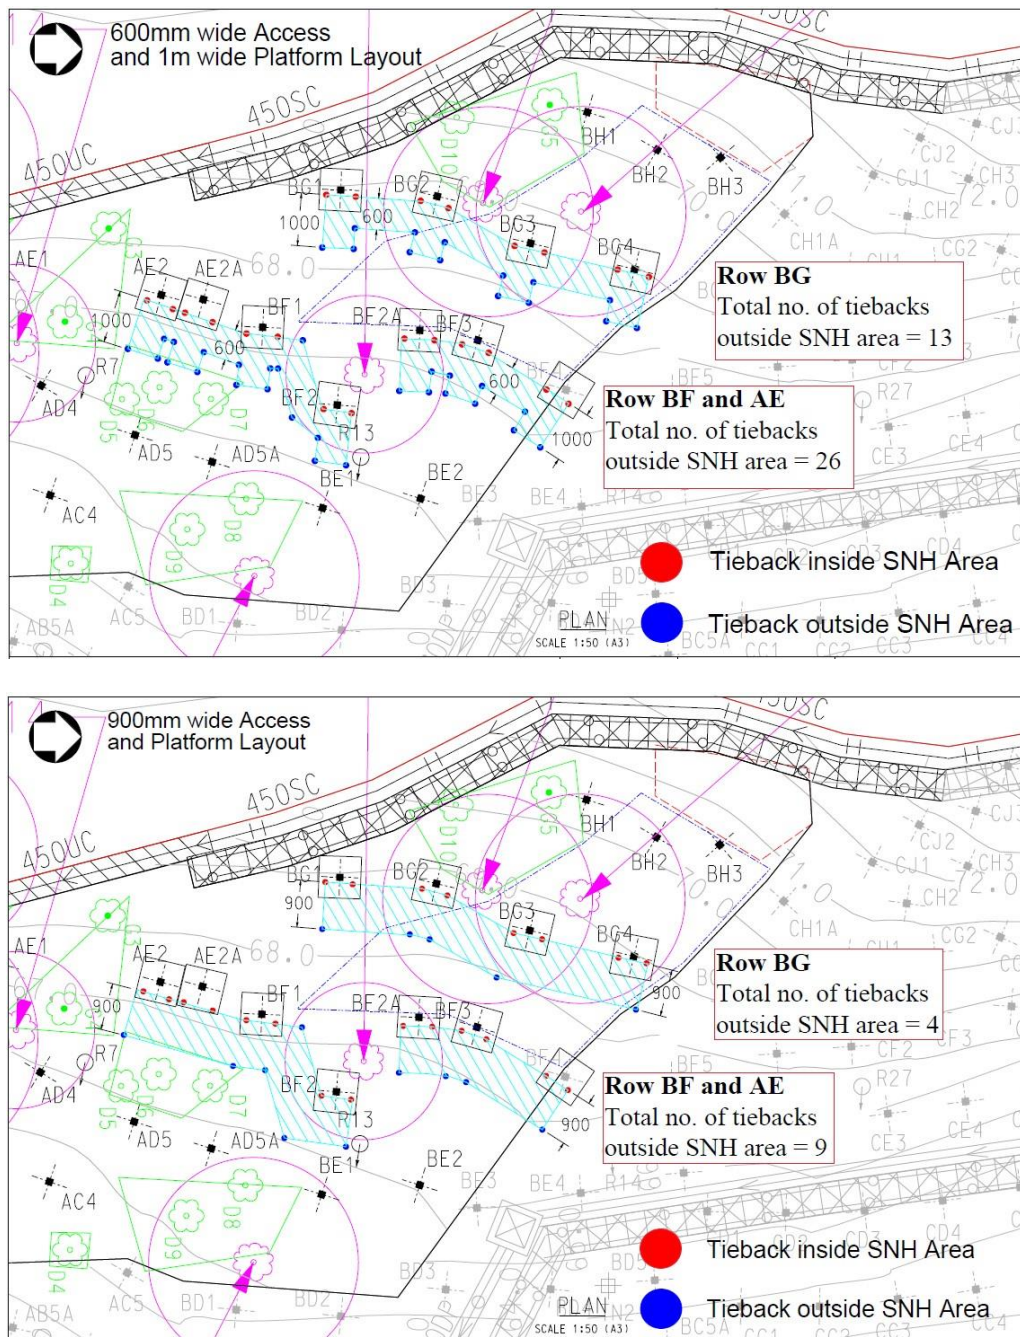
A (upper) and Figure 5B (lower): Fewer tie backs were needed for soil nailing works at Row BG, BF and AE when the width of the access and working platform layout changed from 600mm and 1m respectively into 900mm
